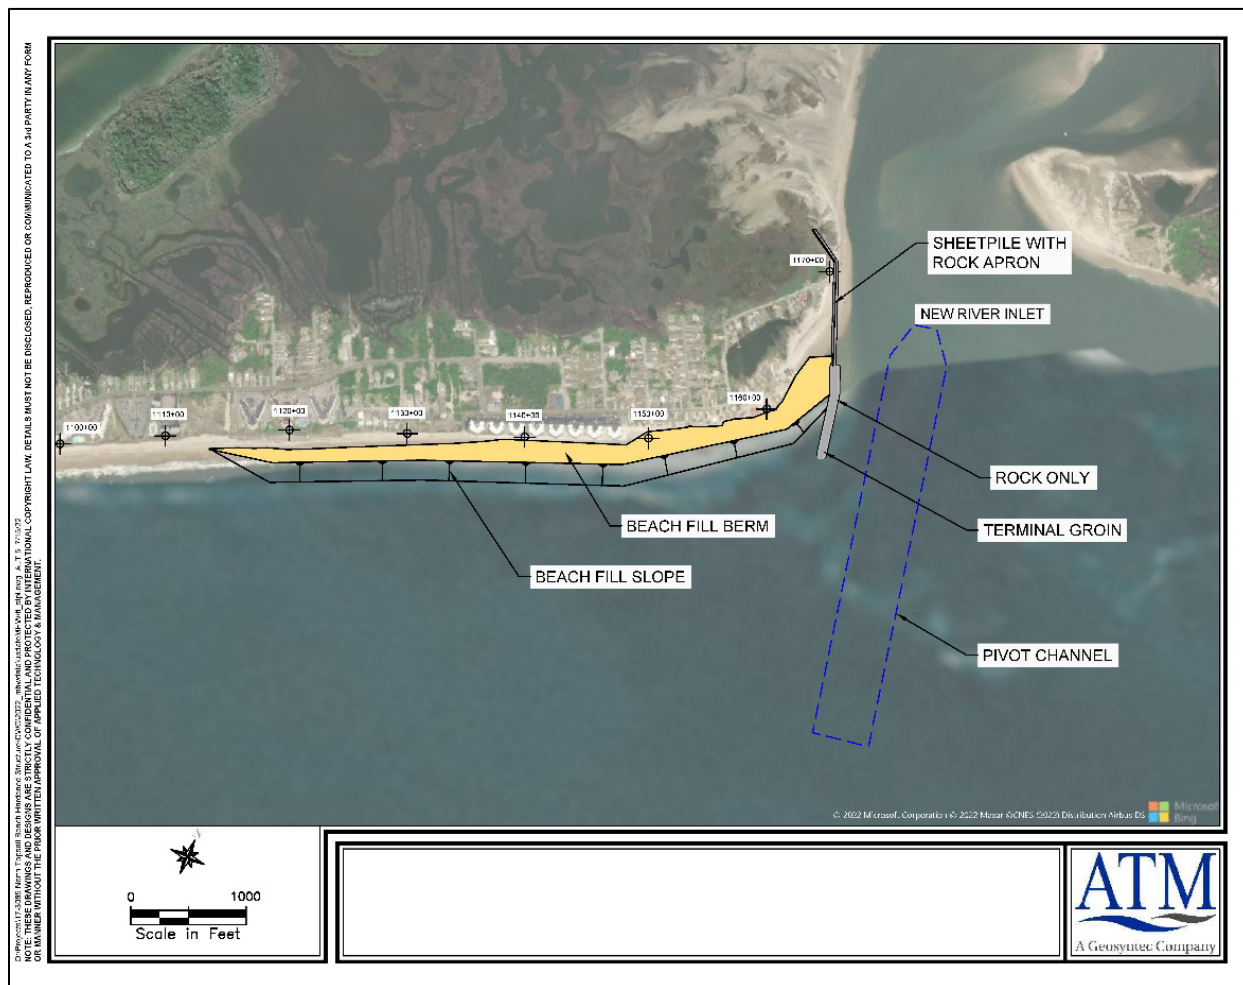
Alternative 5 Beach Fill, Terminal Groin, and Pivot Channel Layout
